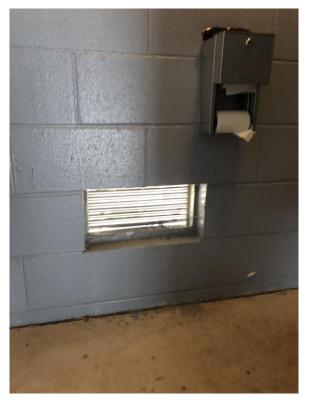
South Bathrooms - Louvered Through-Wall Exhaust Vent
